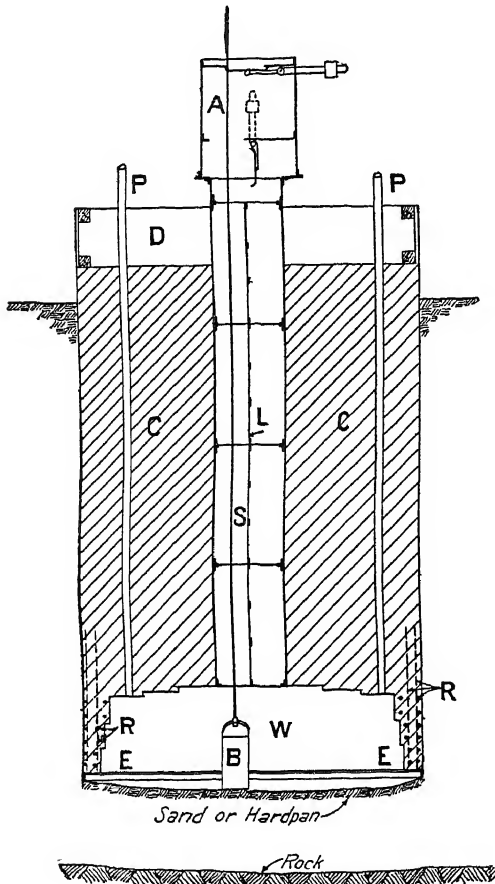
TYPICAL PNEUMATIC CAISSON OF REINFORCED CONCRETE FOR FOUNDATION OF A BUILDING
